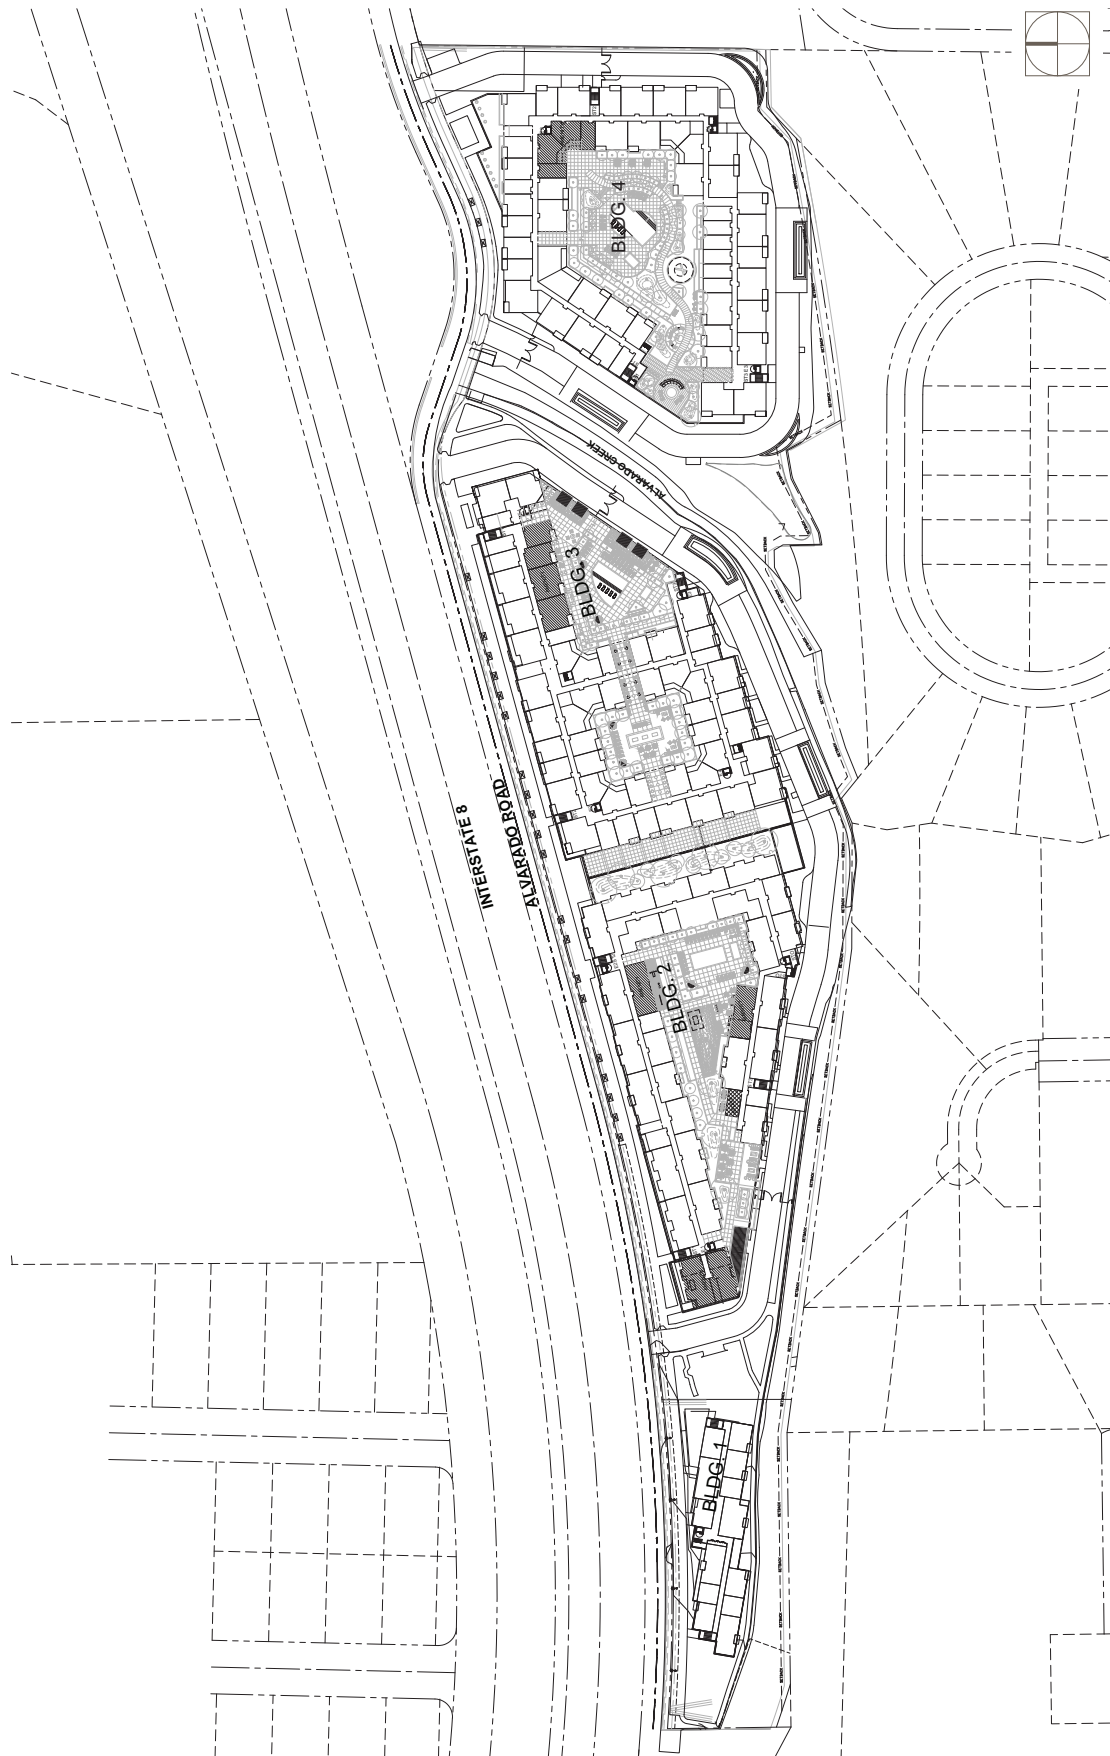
Form-Based Development Standards Typical Building Plan View by Fourth Floor
